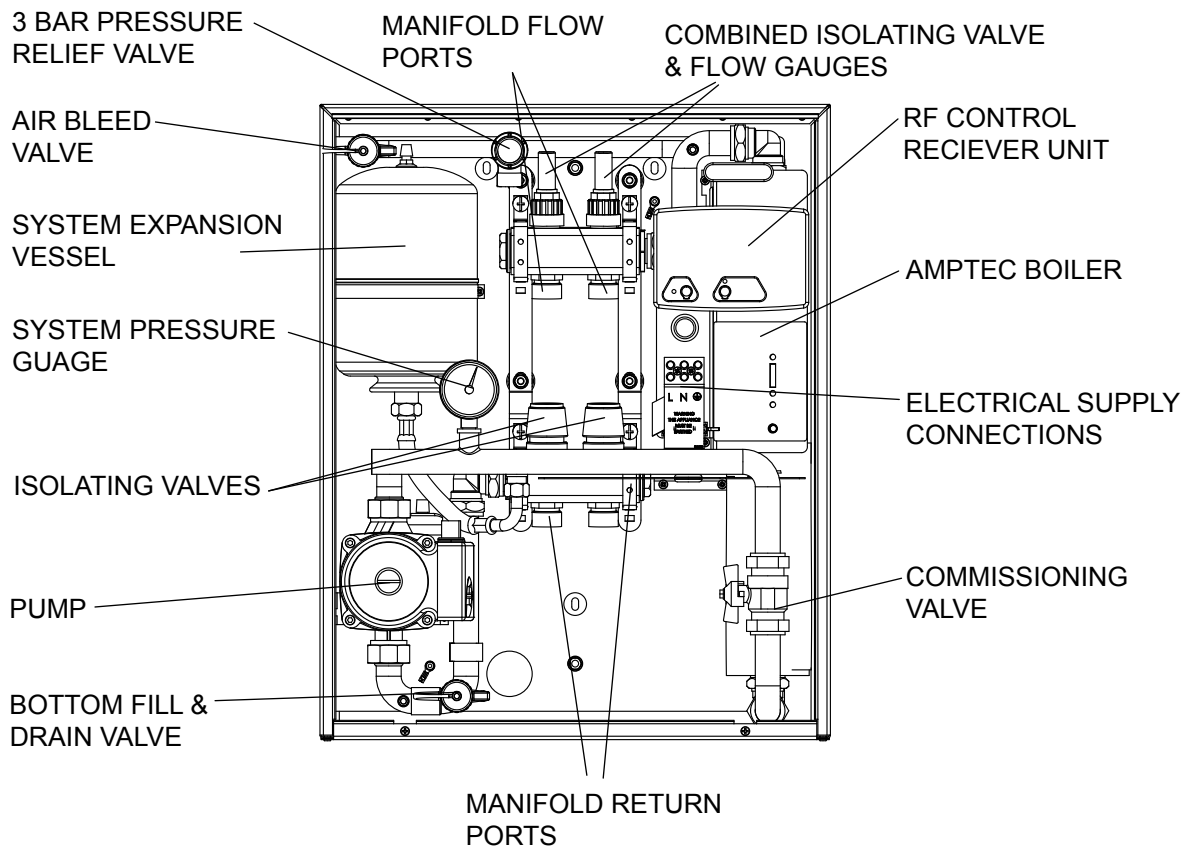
2.5kW ELECTRIC UNDERFLOOR BOILER ASSEMBLY
